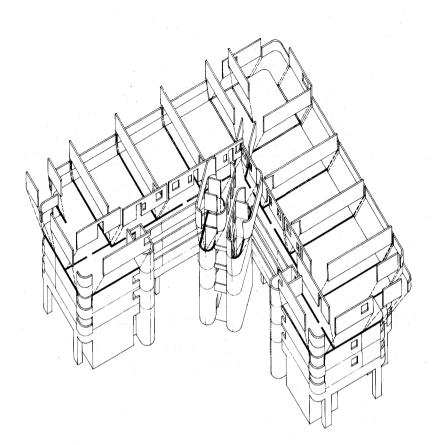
Isometric view of Atlantis Condominiums showing the arrangement of the various precast elements.
